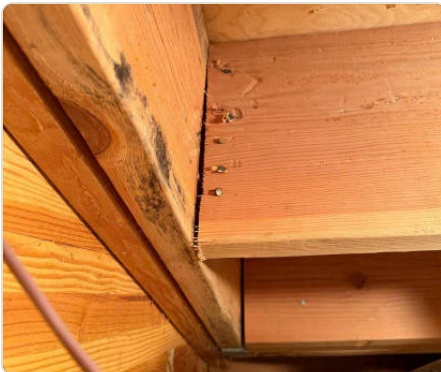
Black patchy staining along a beam edge at a framing bearing point.
